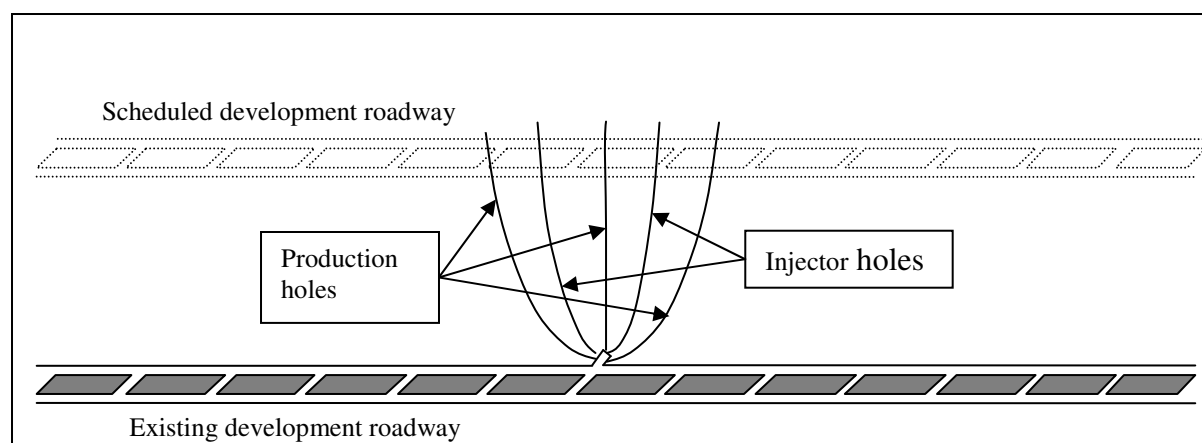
Schematic layout for an underground enhanced gas drainage layout
